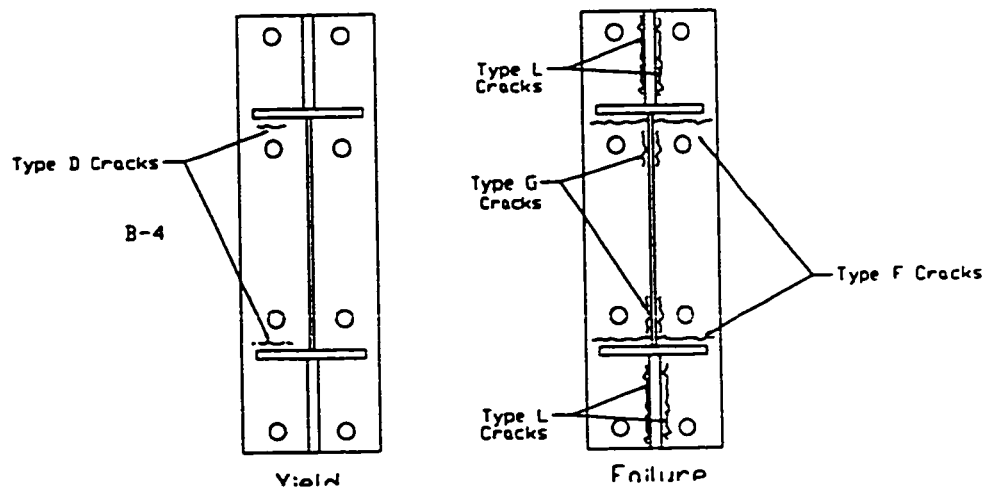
Crack Locations at Yield and Failure for Connection B-4
